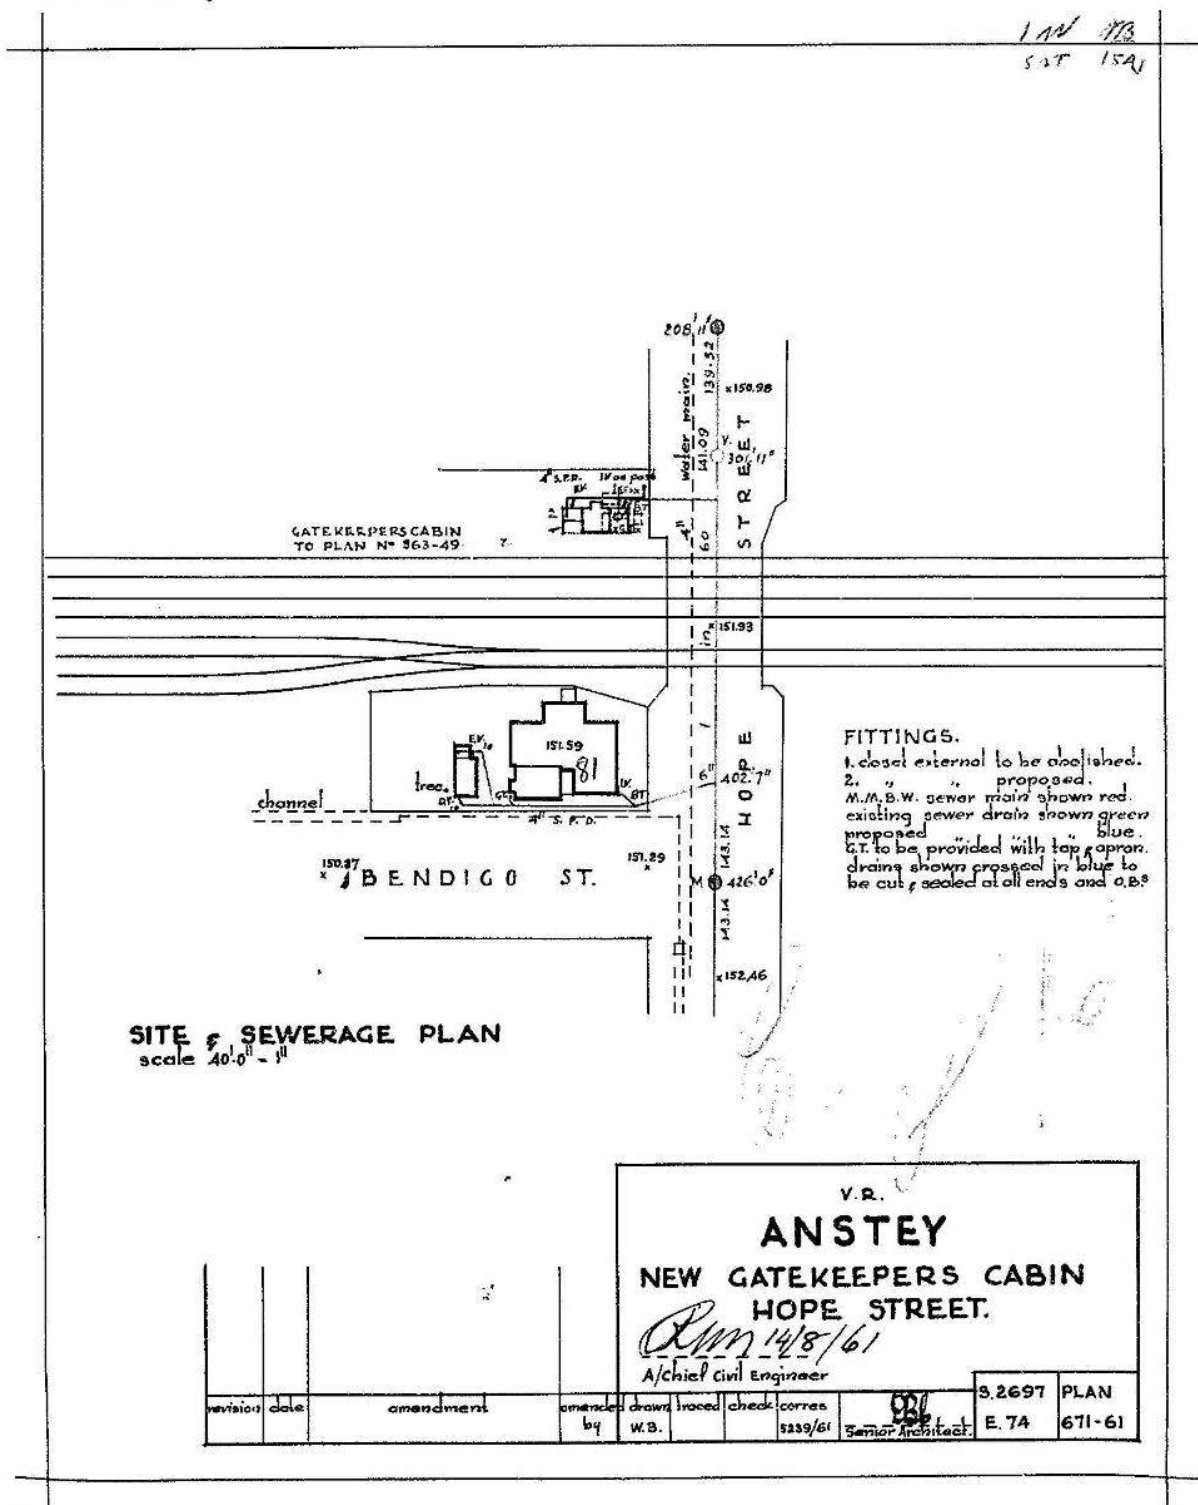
1961 Detail drawing of the Hope Street intersection showing the 'new' gatekeepers cabin at south-west of intersection (north is to right). (Public transport Victoria Drawing Management System. 10/06/2020).
